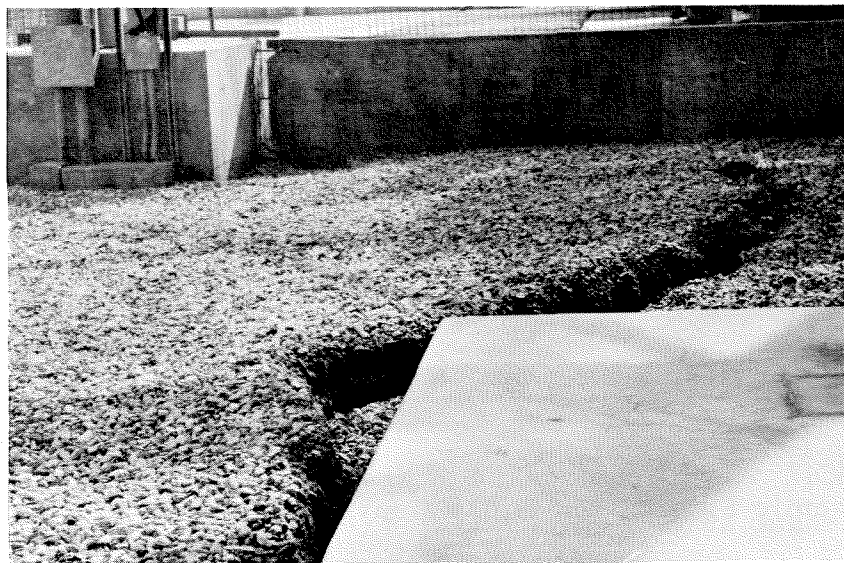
Horizontal displacements inside Sylmar Converter Station evident in ground crack and in separation of wall from column footing in background.
